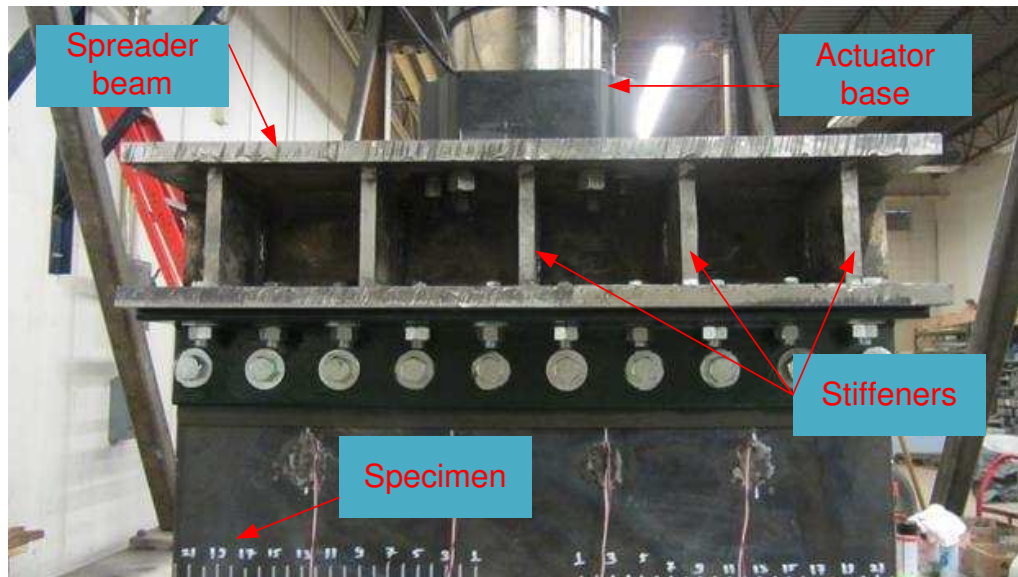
A physical front view of the spreader beam including the specimen, the angle connecting the specimen and actuator
